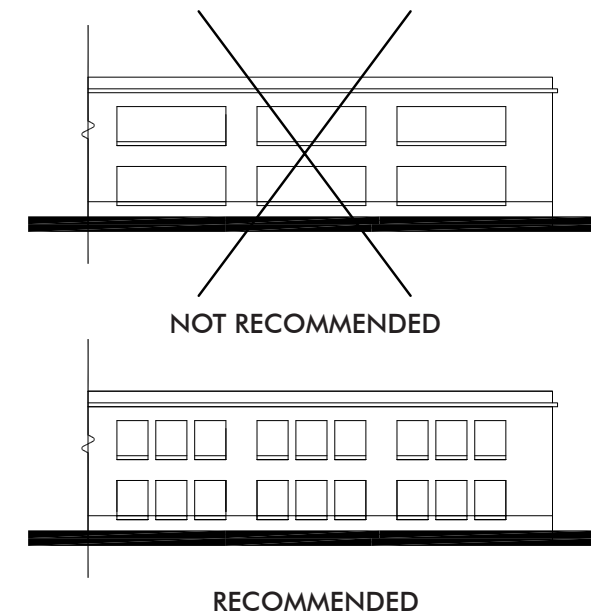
A.4.A.VII PARKING STRUCTURE
